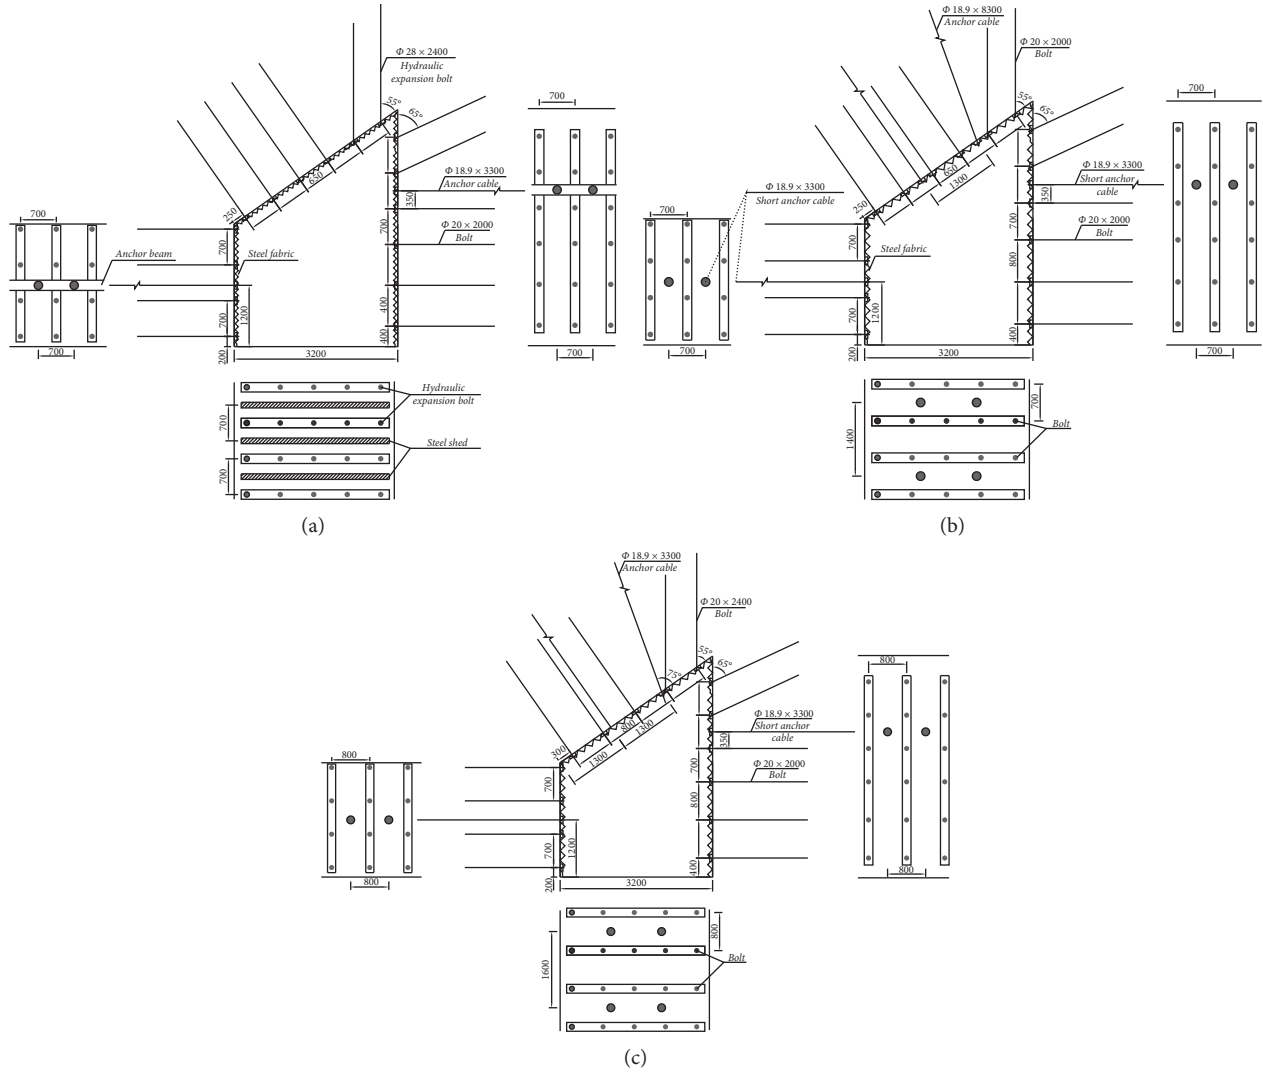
Support section of the roadway: (a) class-I roof roadway, (b) class-II roof roadway, and (c) class-III/IV roof roadway.
